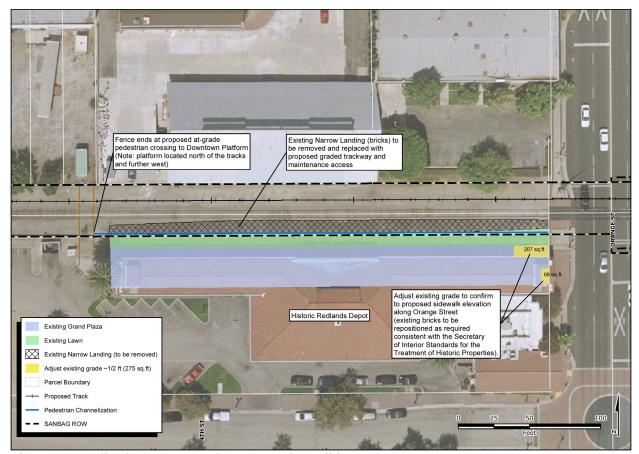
Redlands Santa Fe Station Proposed Conditions.
